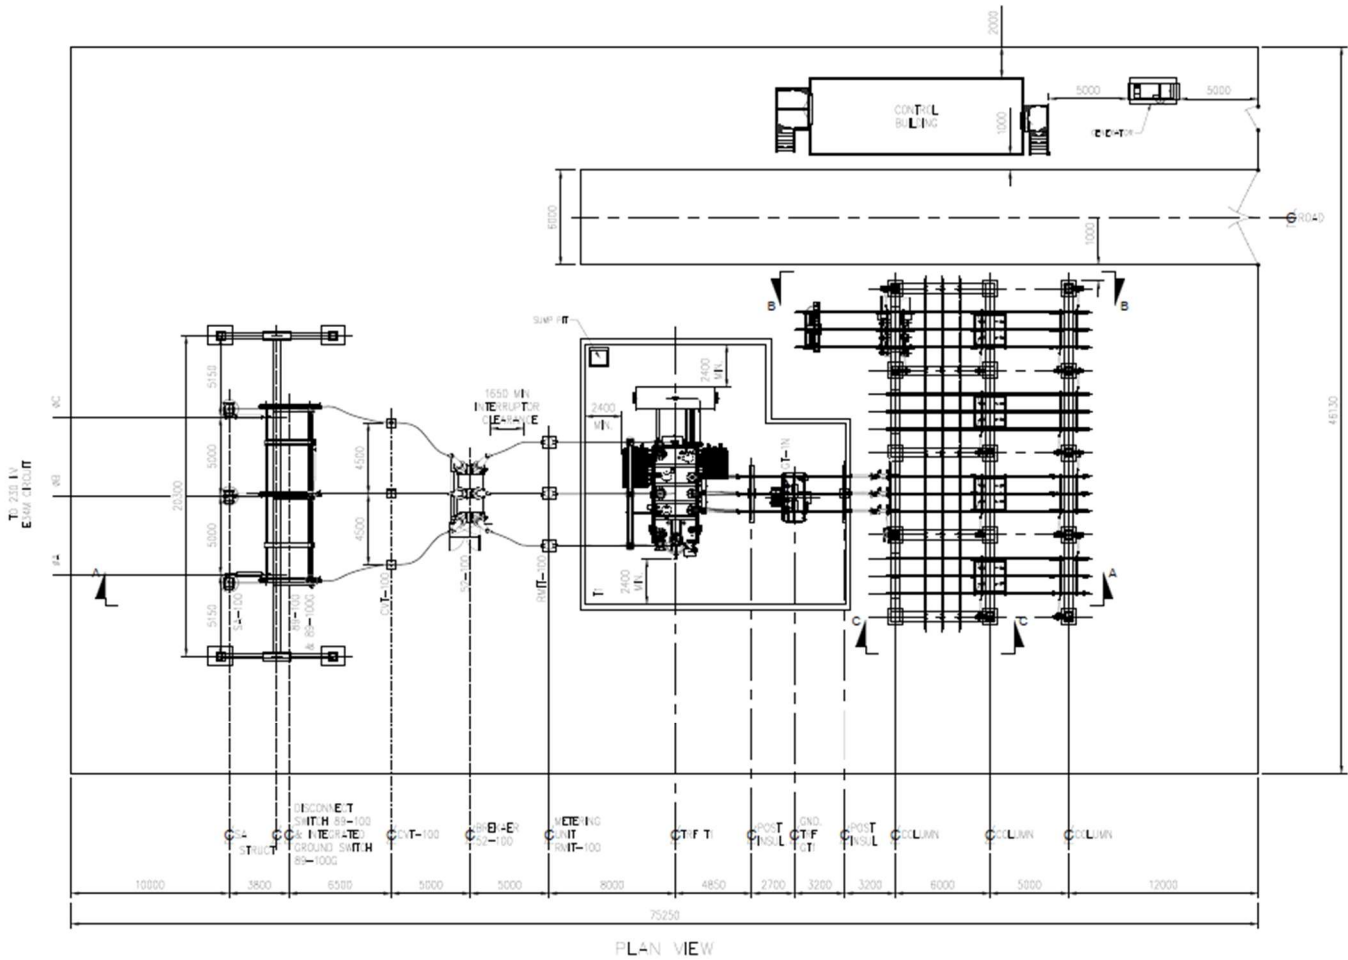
above is the Trail Road 230 kV Substation overhead plan view
